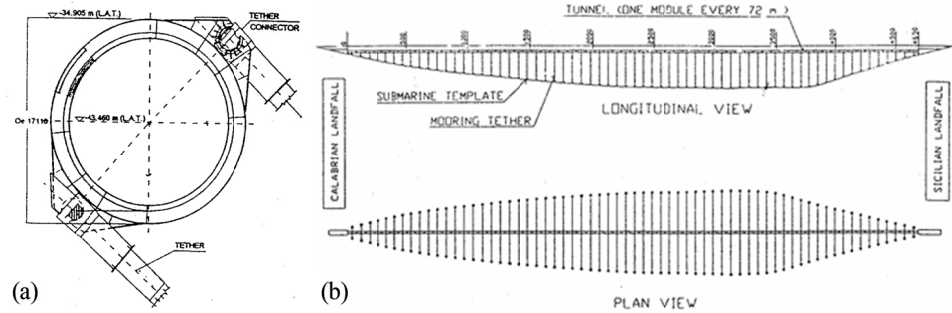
SFT proposal for the Messina Strait crossing by ENI Consortium (Nicolussi and Casola, 1994): (a) tunnel cross section and detail of the tether connections; (b) tunnel lay-out.
